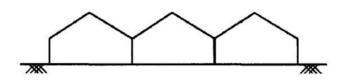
Ridge and furrow greenhouse (Radha & Igatidnathane 2007, 9)
